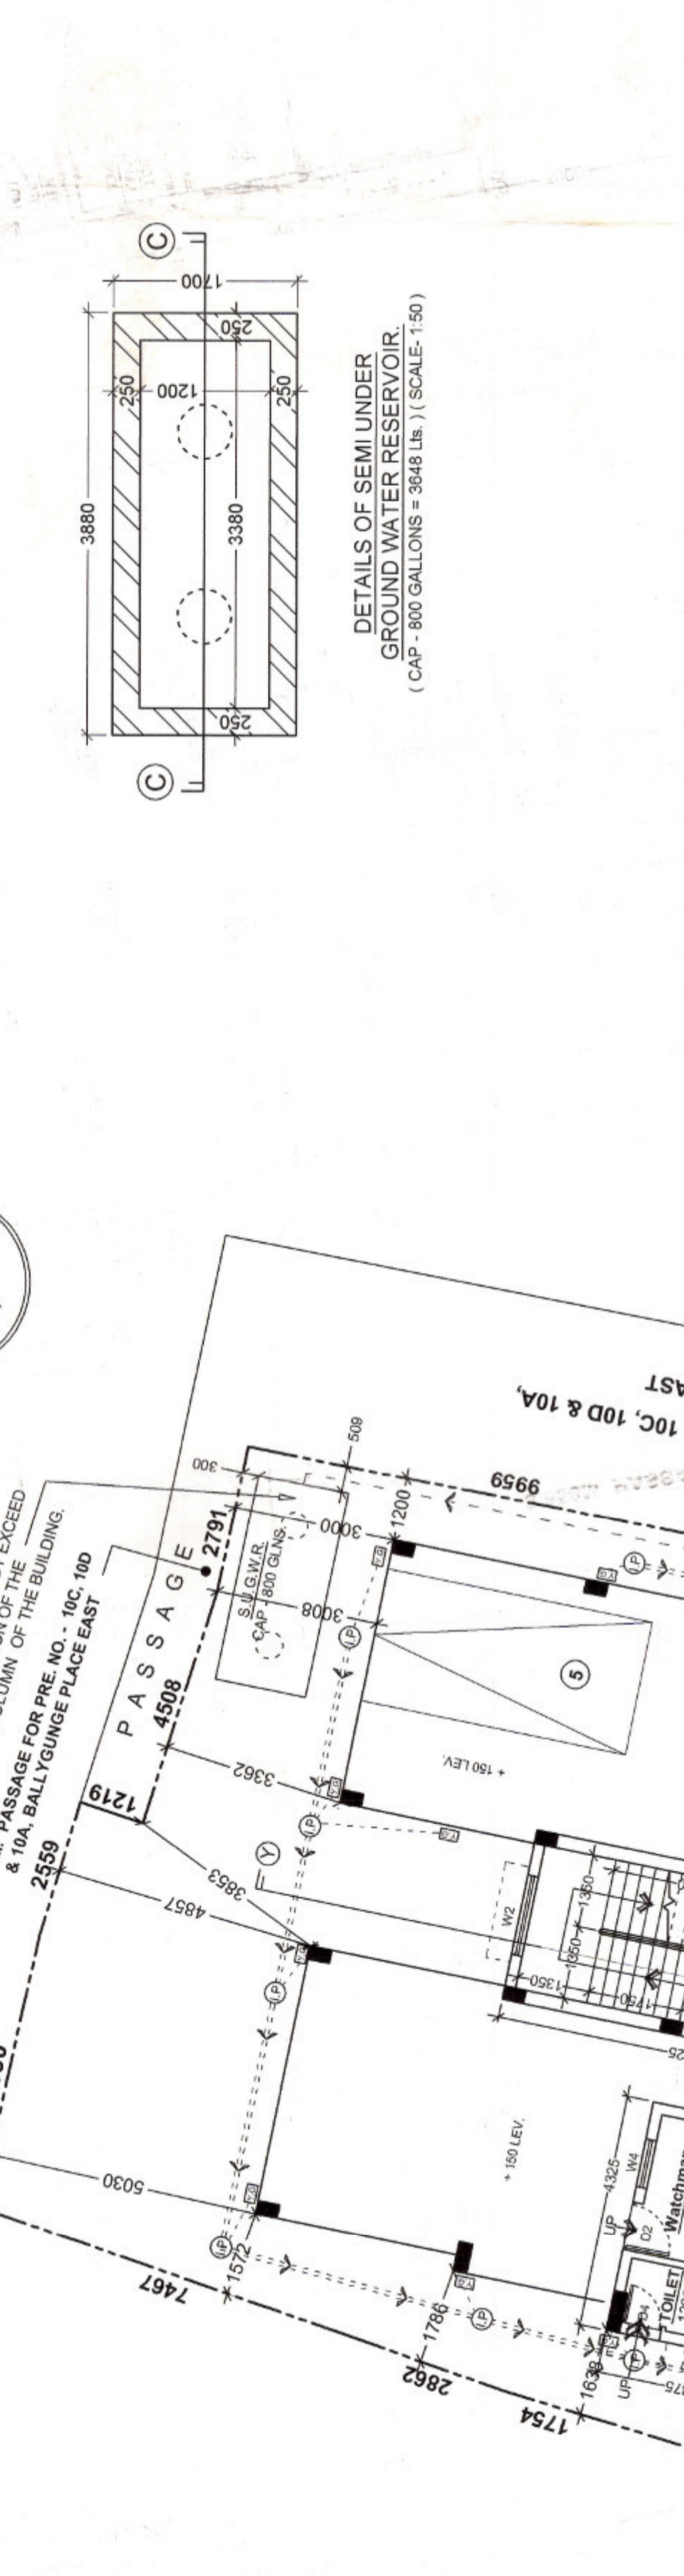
DETAILS OF SEAM UNDER GROUND WATER RESERVOIR
